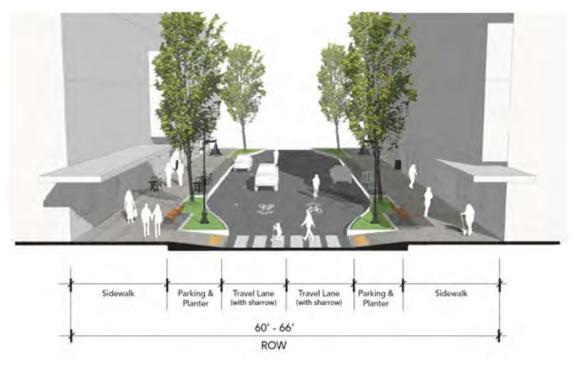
Cross Section - East West Connector (low traffic volume, open space edge)
